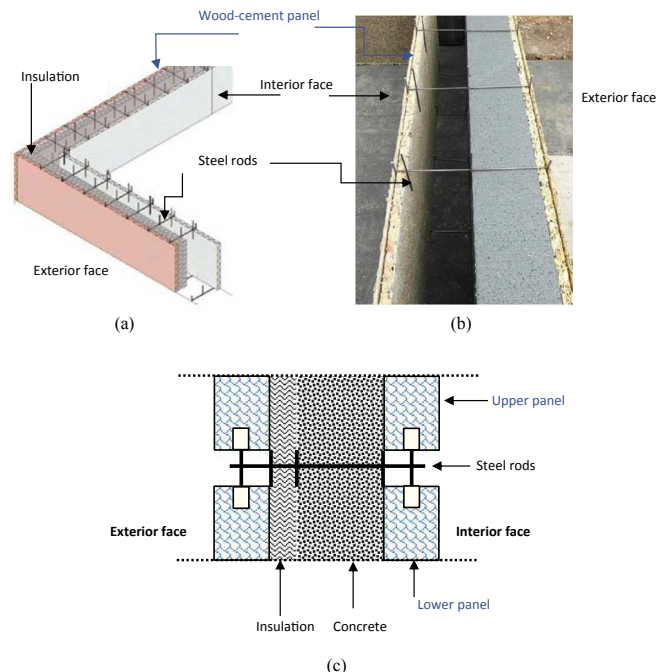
Schematic of the formwork: (a) wall; (b) panel, and (c) stack of panels.
